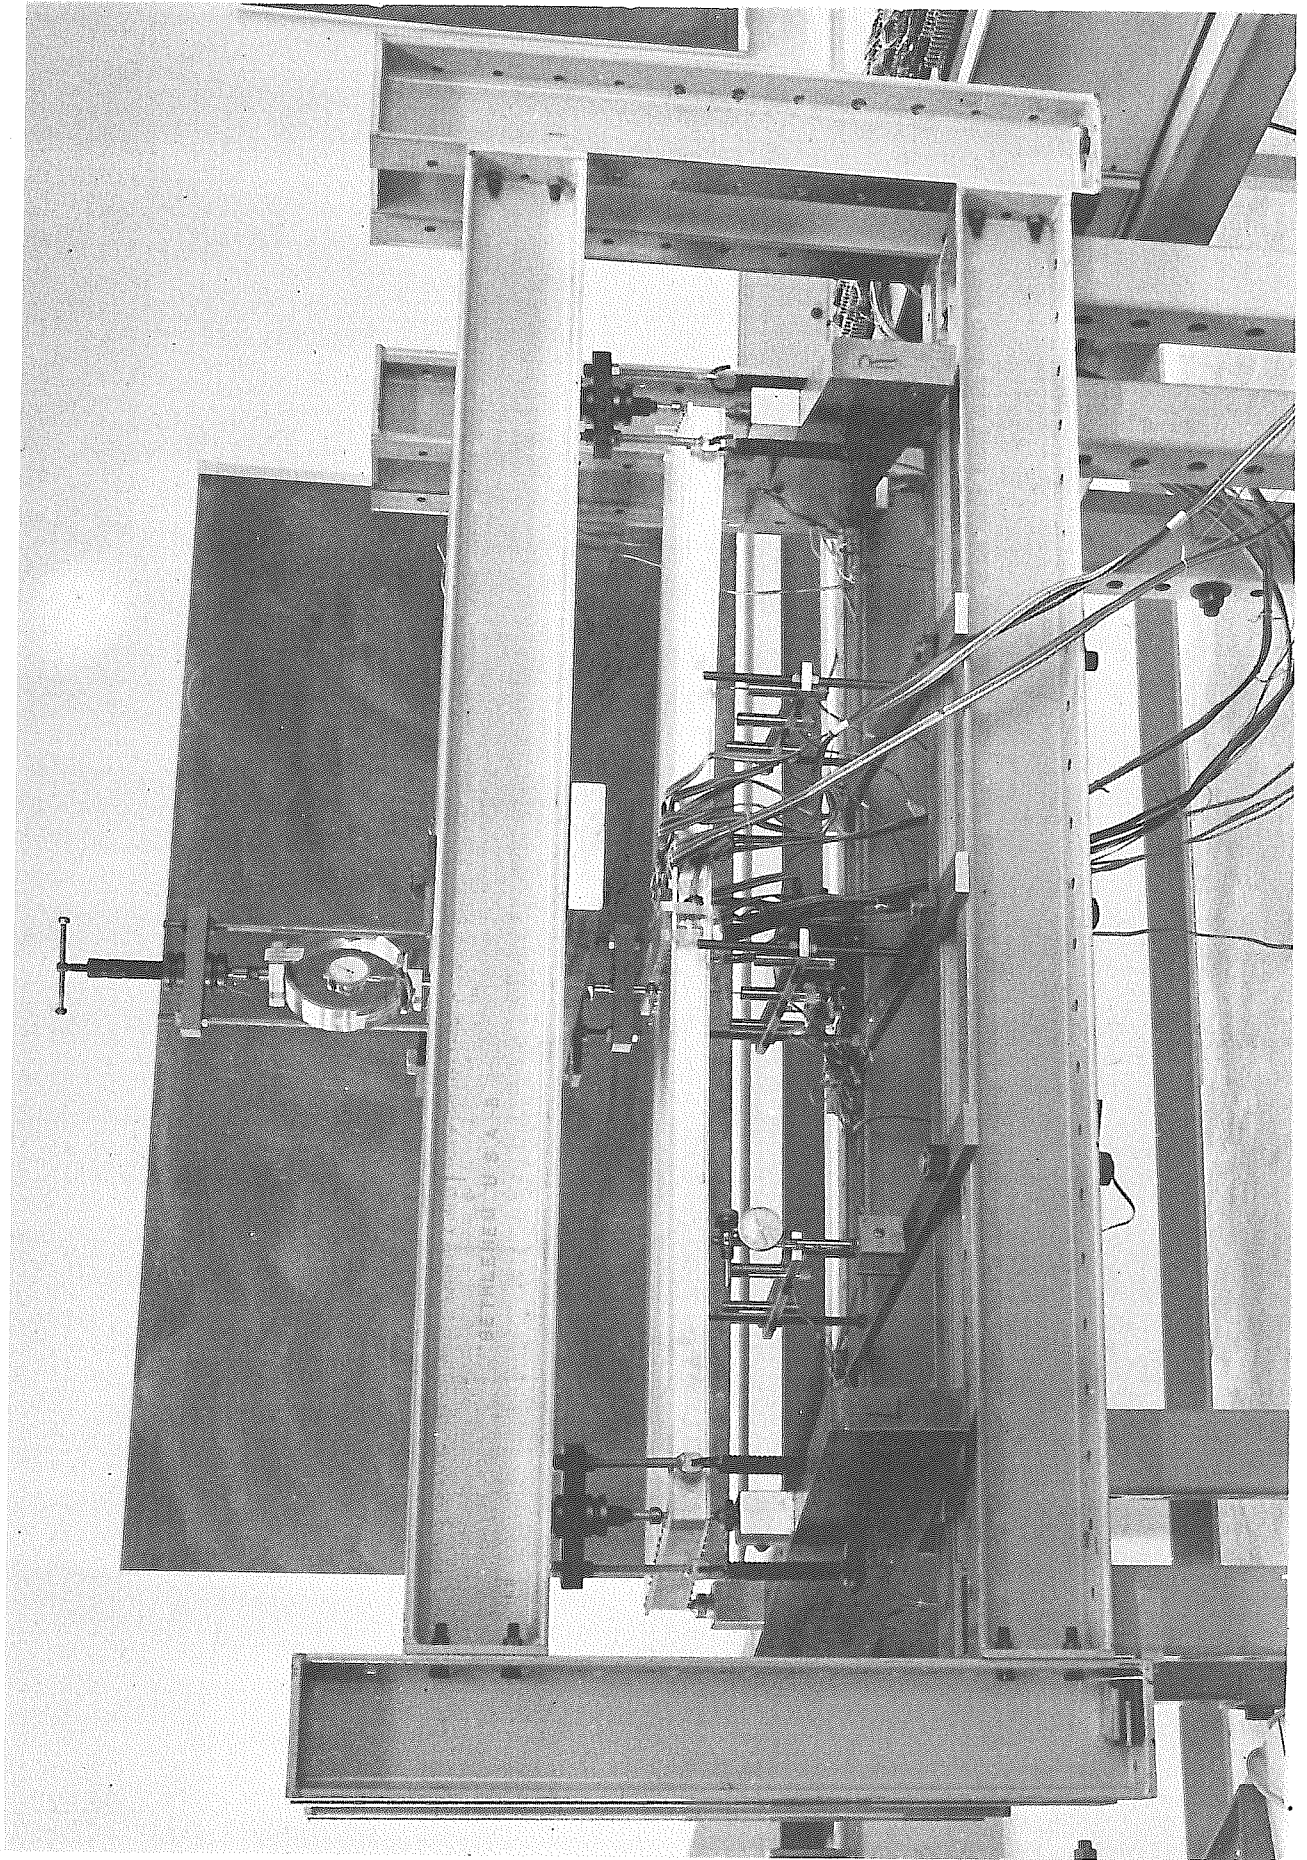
STRAINING FRAME WITH BRIDGE MODEL UNDER TEST
